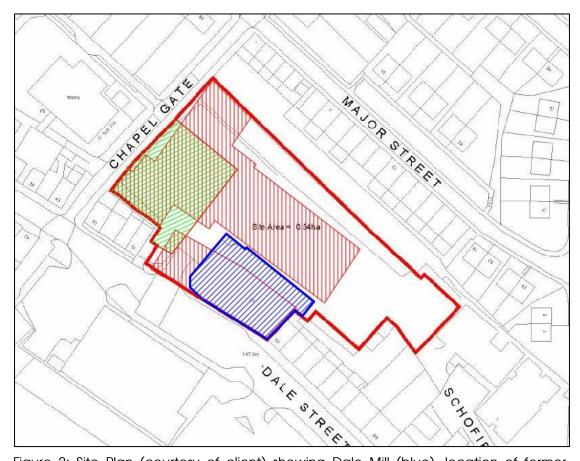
Site Plan (courtesy of client) showing Dale Mill (blue), location of former modern building (green) and location of the former Church Street Mill (red)
